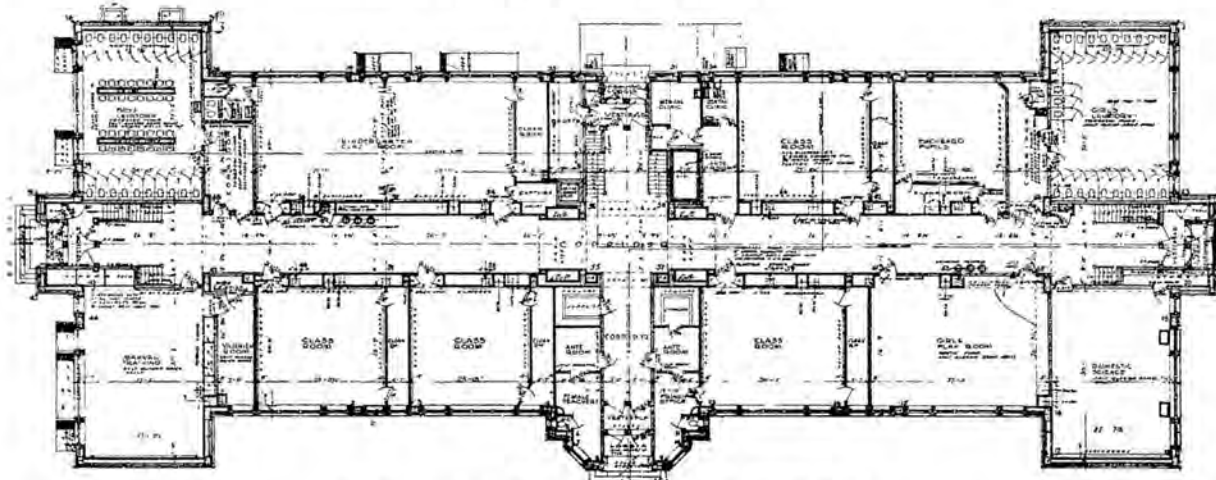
GROUND FLOOR PLAN—A THREE STORY SCHOOL WITHOUT BASEMENT, HAMILTON, ONT.
